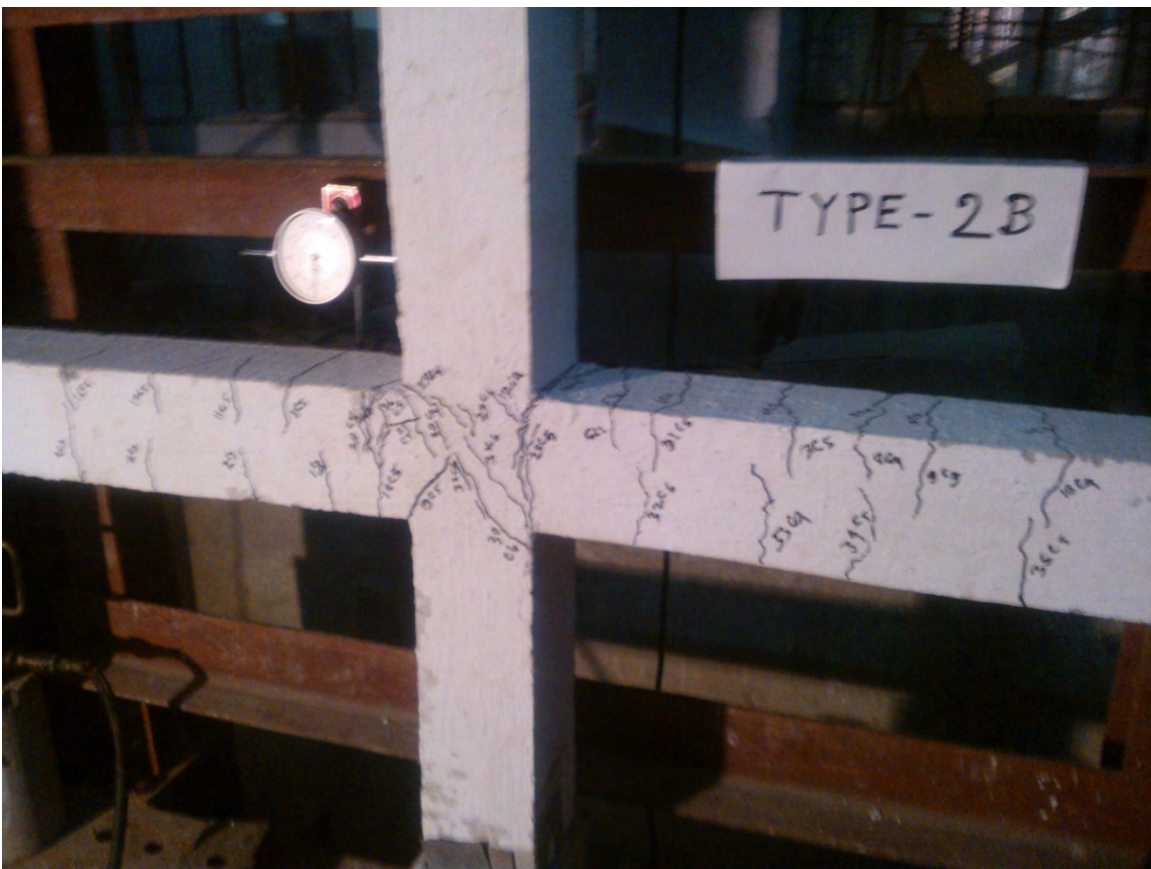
Final Crack Pattern of Type 2B Specimen
